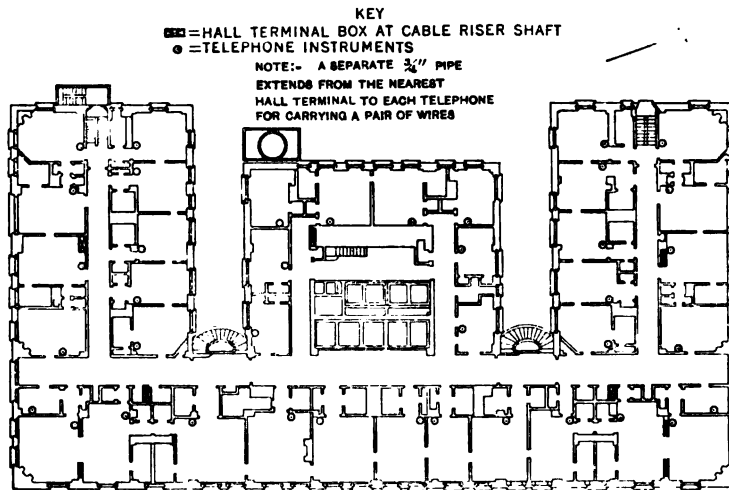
18-STORY HOTEL, TYPICAL FLOOR PLAN.
